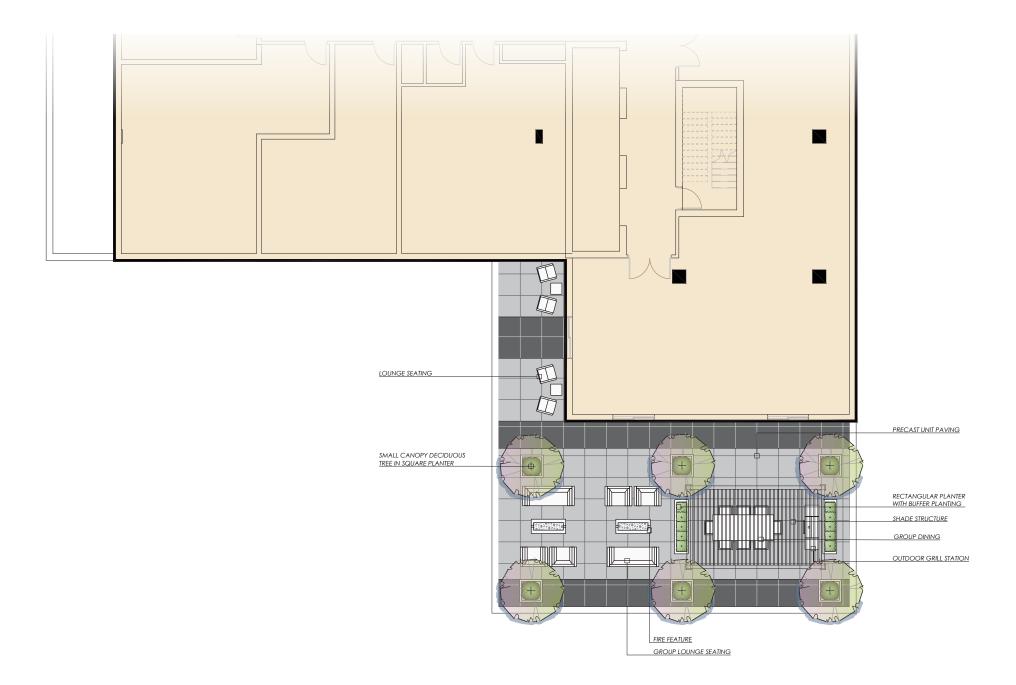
Rooftop Concept Plan prepared by Adesso Design Inc.
